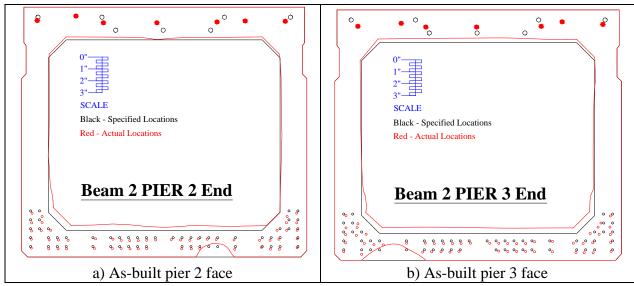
As-Built Section Geometry of Span 3 Beam 2 of Main Street Bridge
